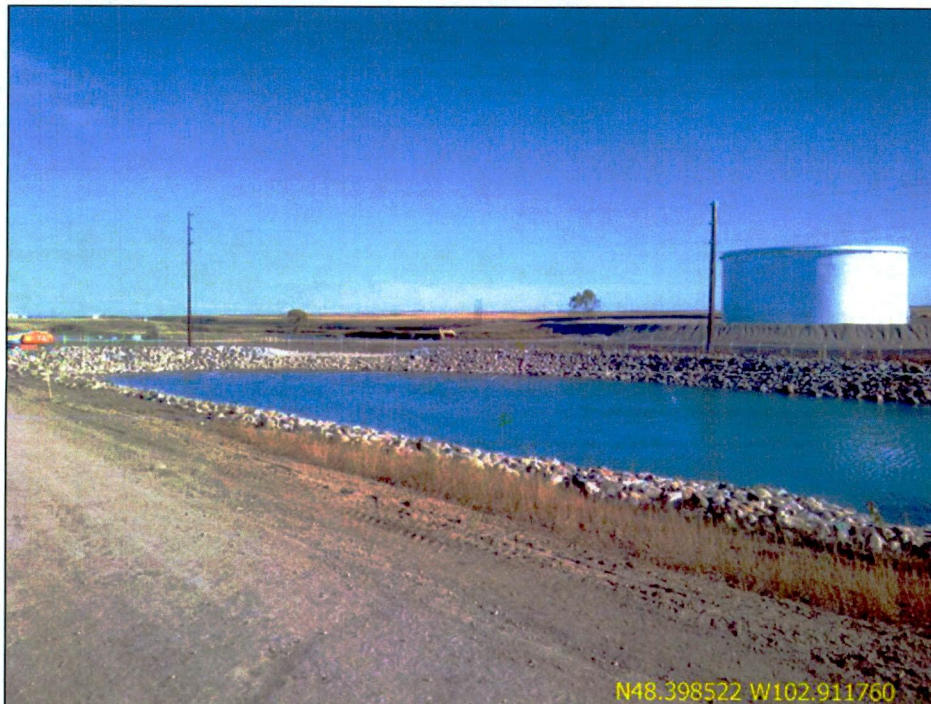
Storm water retention pond located on south side of expansion site. All on-site water is collected here and sediments settle out. Mr. Lee stated that the majority of this water is reused on-site for dust control and various construction activities.
